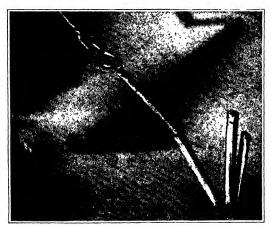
Withdrawing Spring, While Bending It, after Use in Thin-Wall Conduit
